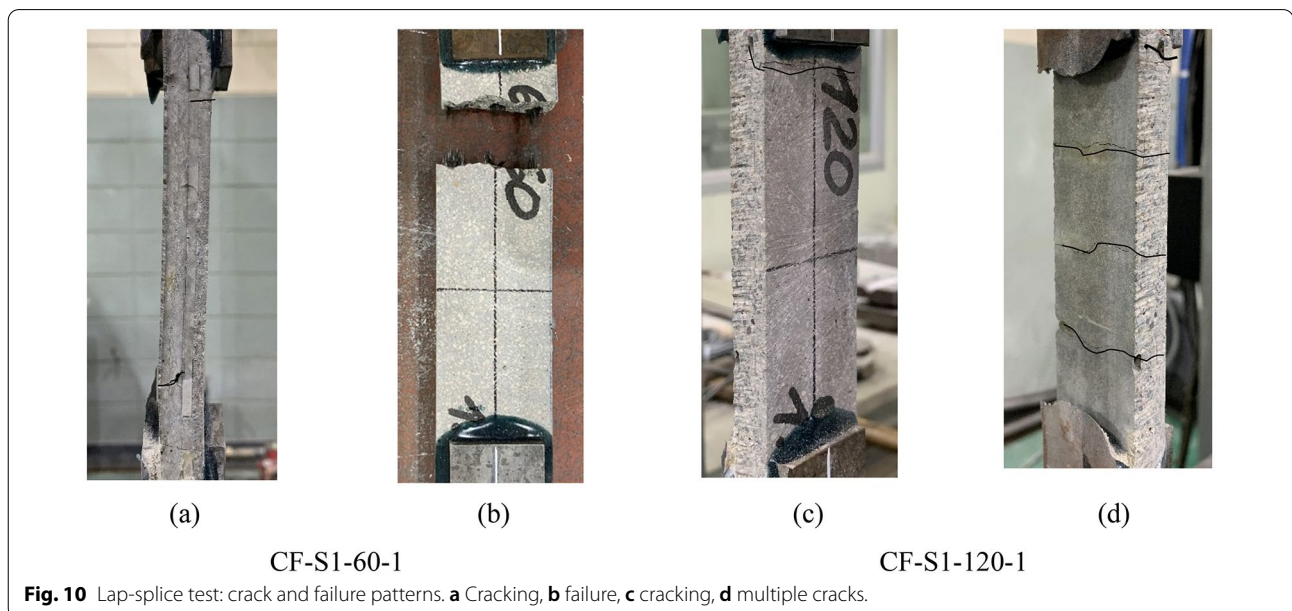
Lap-splice test: crack and failure patterns. a Cracking, b failure, c cracking, d multiple cracks.
